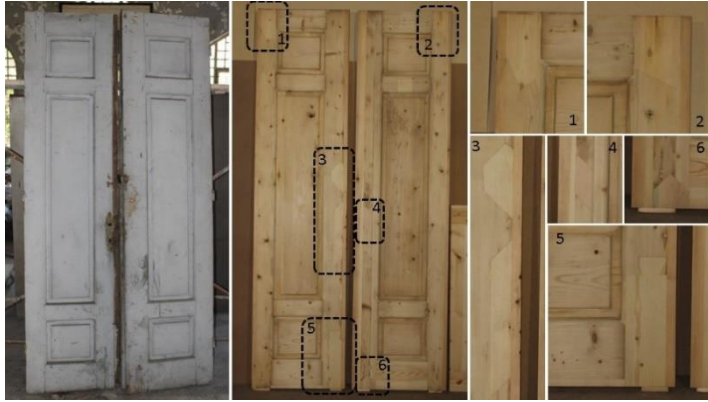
Ground floor door example, details of the consolidation technique 2012-2017 (Osmanoğlu)
